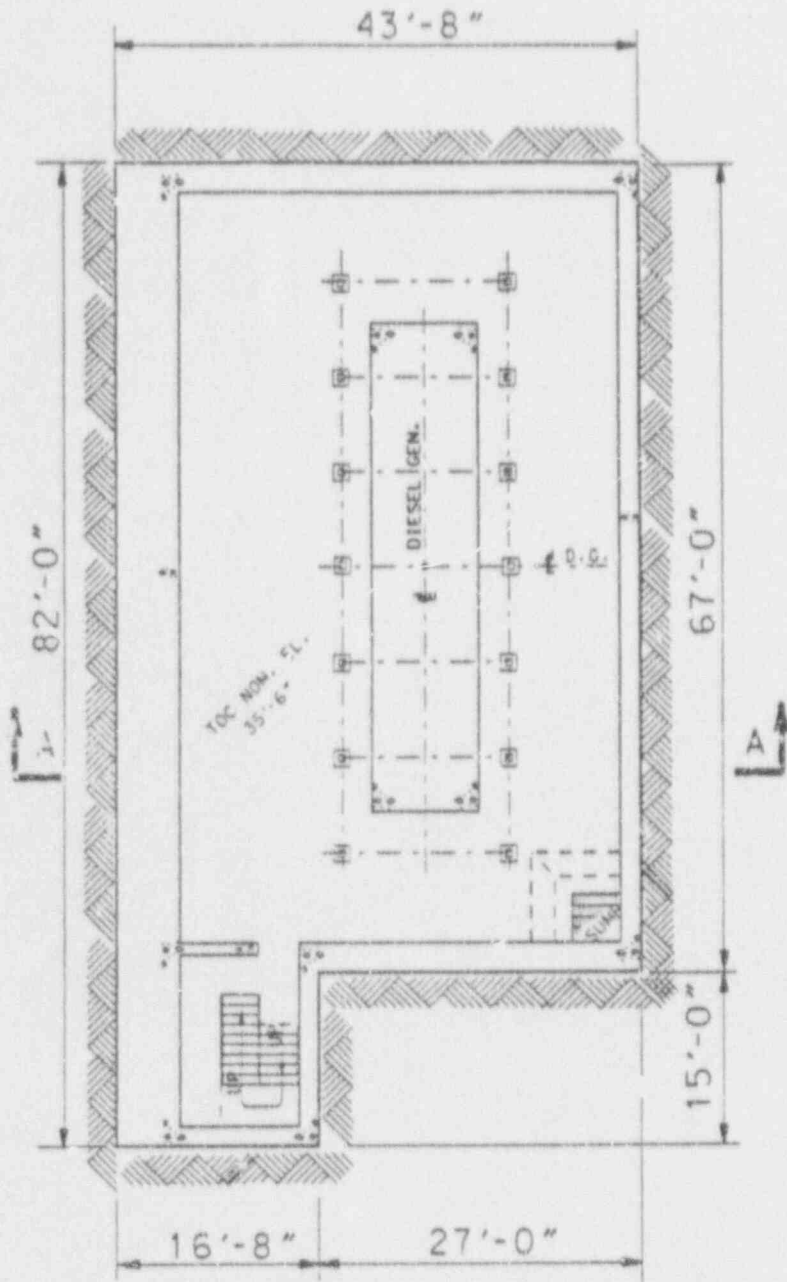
PLAN VIEW - EL. 35'- 6"
